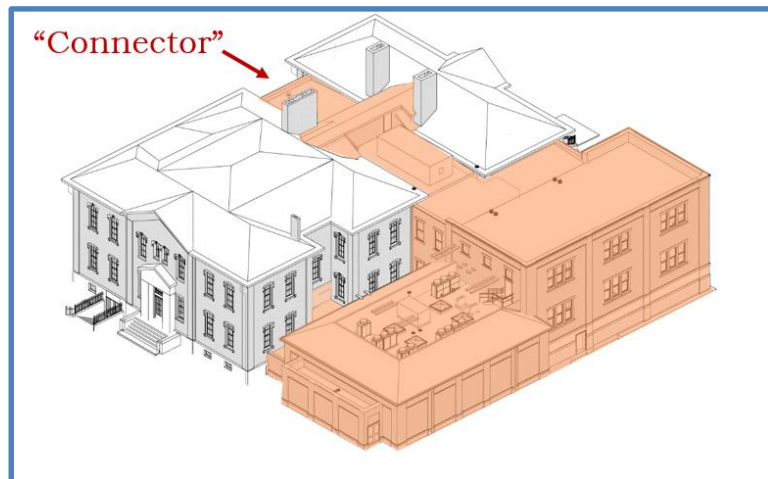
Isometric drawing of project, highlighting new construction. (Hardlines Design Company)
